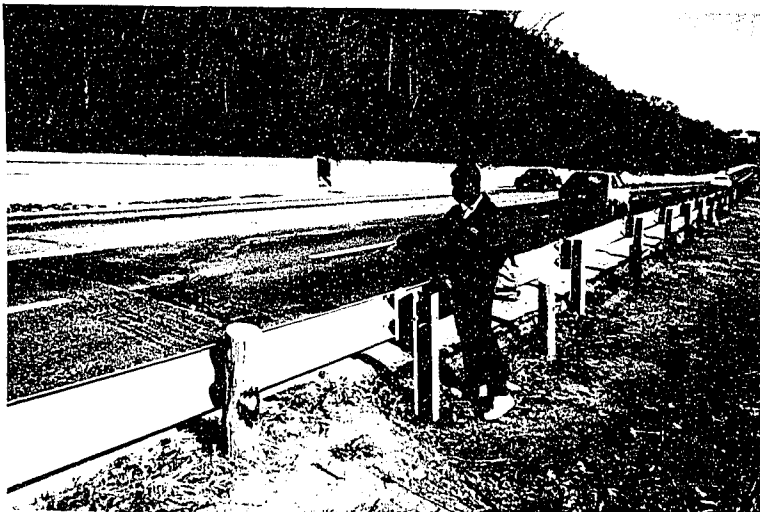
Headscarp cutting through pavement of Columbia Parkway (note vertical displacement of roadway at Brian's feet). (Photo by Robert Olson, 1988).
